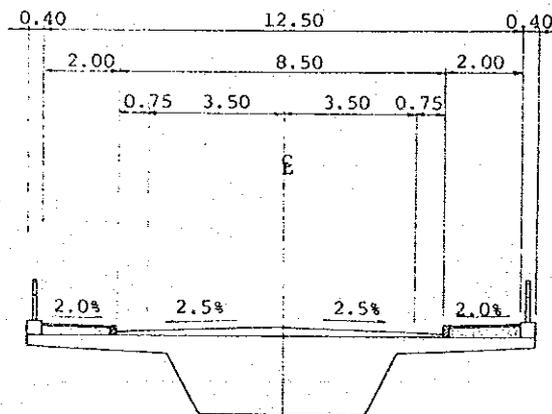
WIDTH OF BRIDGE (Unit: m)
